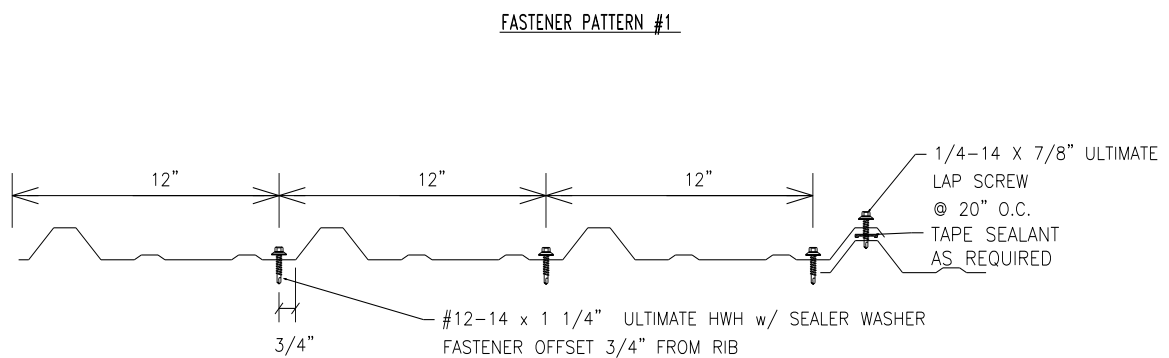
Super Span-X Metal Roofing Panel Secured to 16-gauge Steel Purlins
